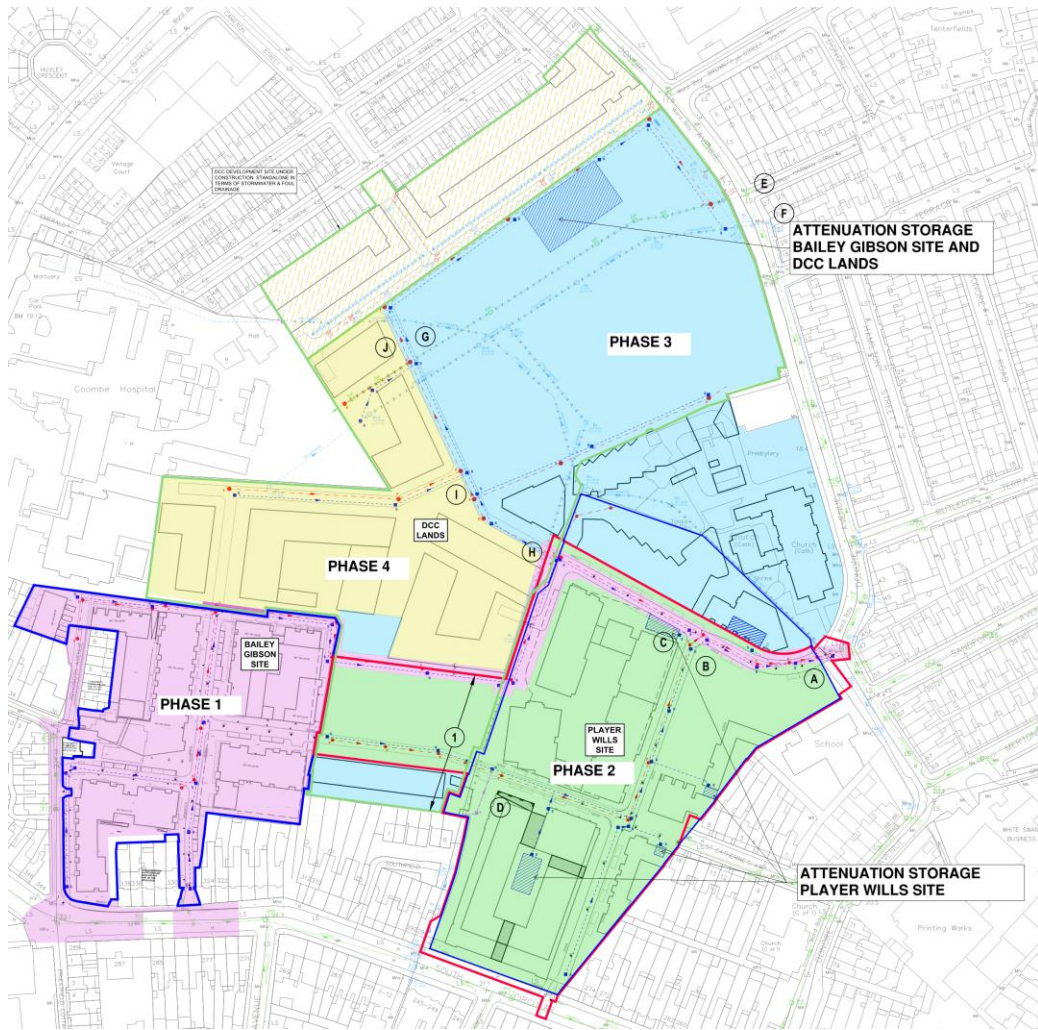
PROPOSED MASTERPLAN DRAINAGE PHASING
